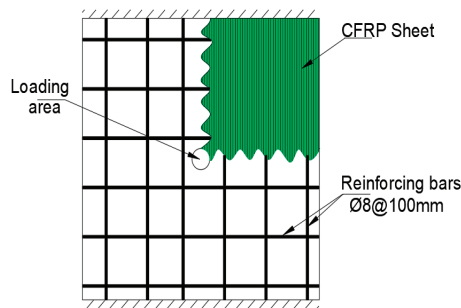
One-way supporting concrete specimen strengthened with CFRP sheet covering the entire specimen except the circular loading area [37].
